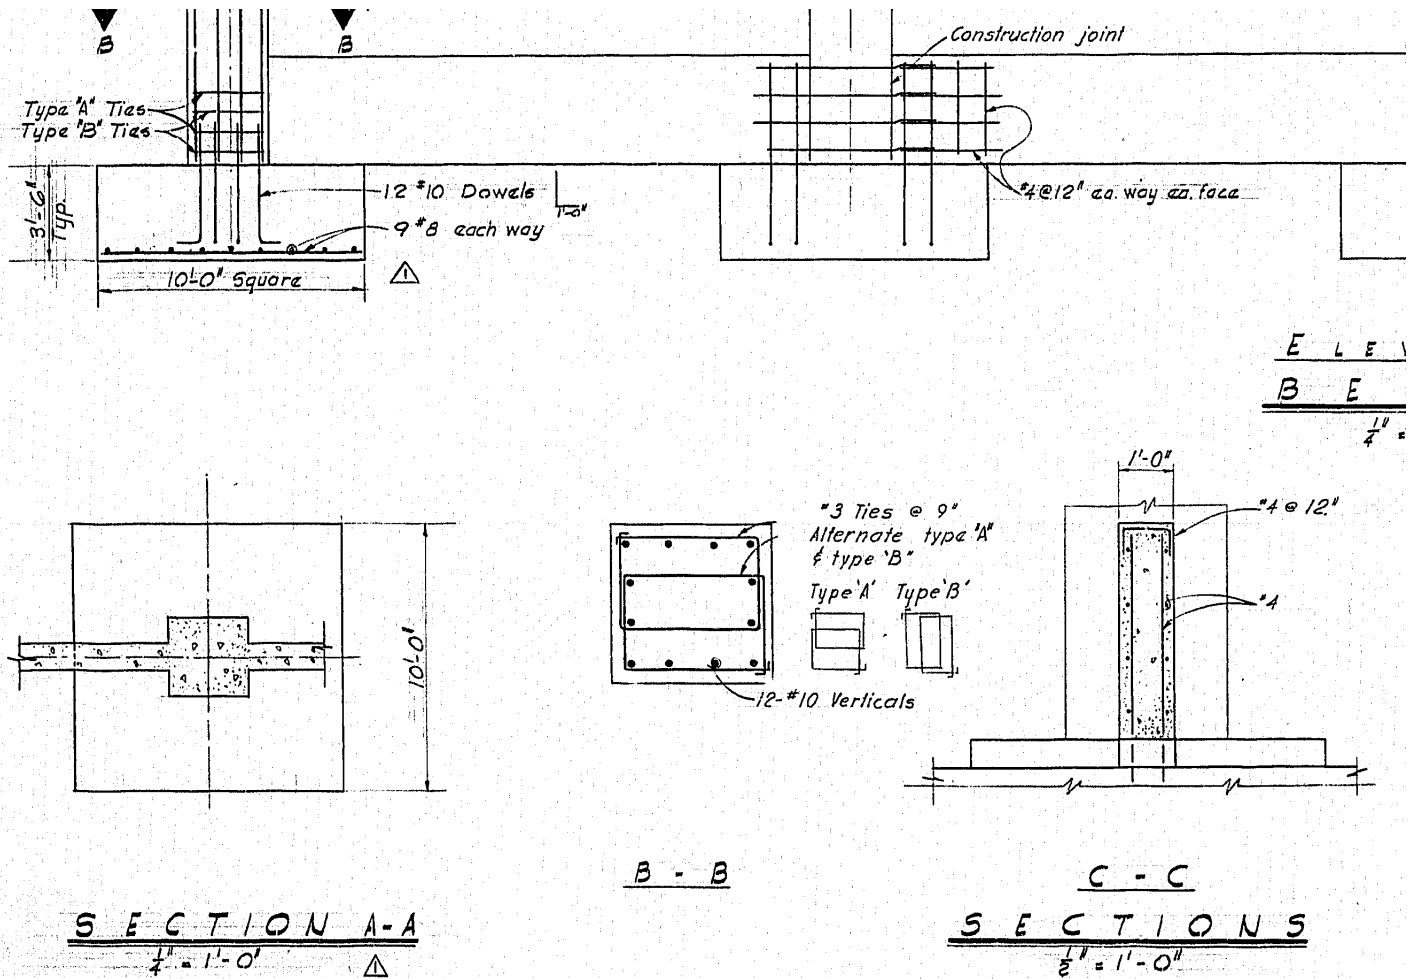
Bents 2, 3, 4, 7, 8, 9, 10, and 11 spread footing with no top layer of reinforcing in footings. Only Bent 2 with short 1ft wall at bottom of column
